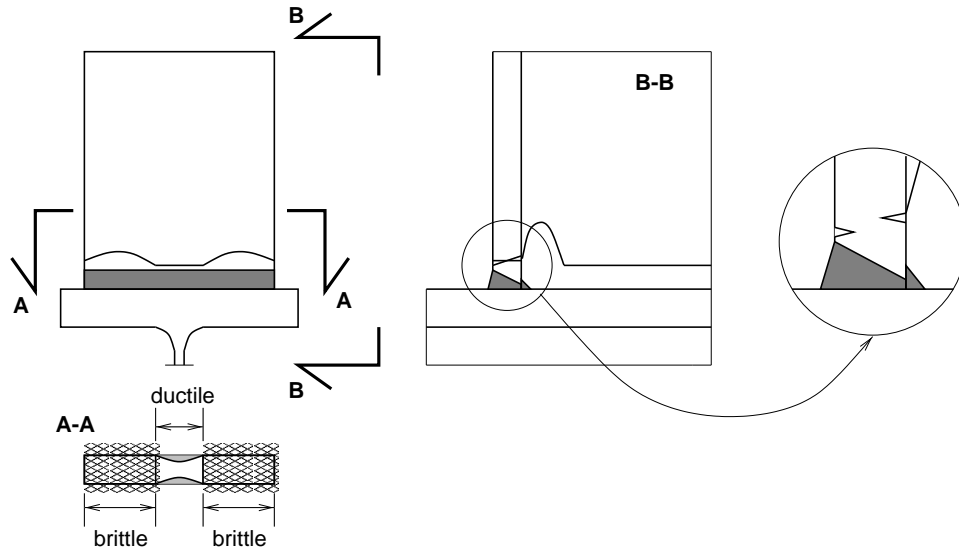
Geometry of the flange crack in post-Northridge connections.
